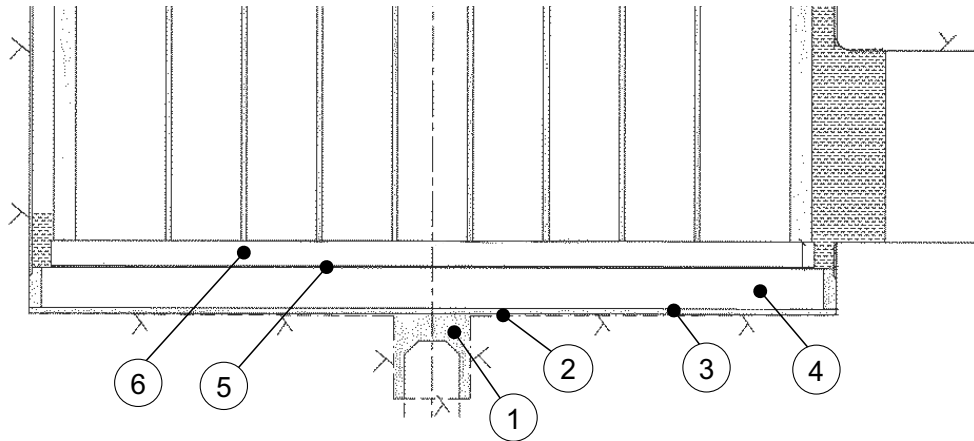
The foundation of the silo. Key to numbering: 1) Silo drainage tunnel, 2) Blinding for levelling, 3) Bottom drainage system, 4) Bottom bed 90/10 sand bentonite, 5) Sealing layer, 6) Slab of concrete silo (Börgesson et al. 2015).
